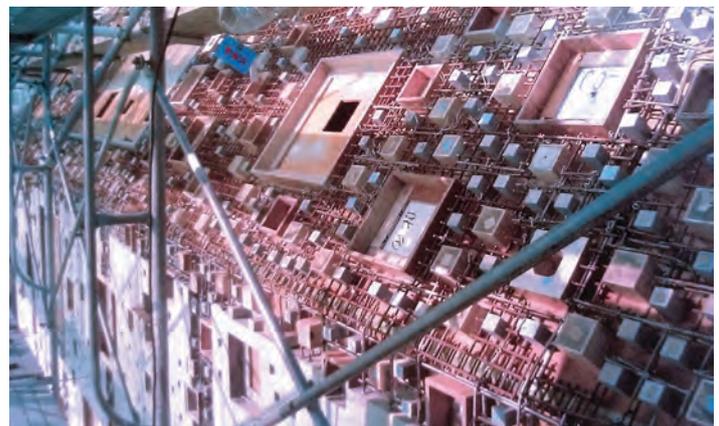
, "Shin Yatsushiro Monument", pre-cast walls and cast in place roof, 7cm thick glass fibre-reinforced concrete, roof casting process, Kumiko Inui
